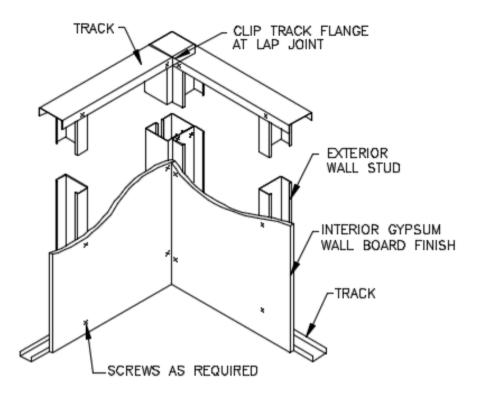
Wall-to-Wall Corner Connection Perspective View.
